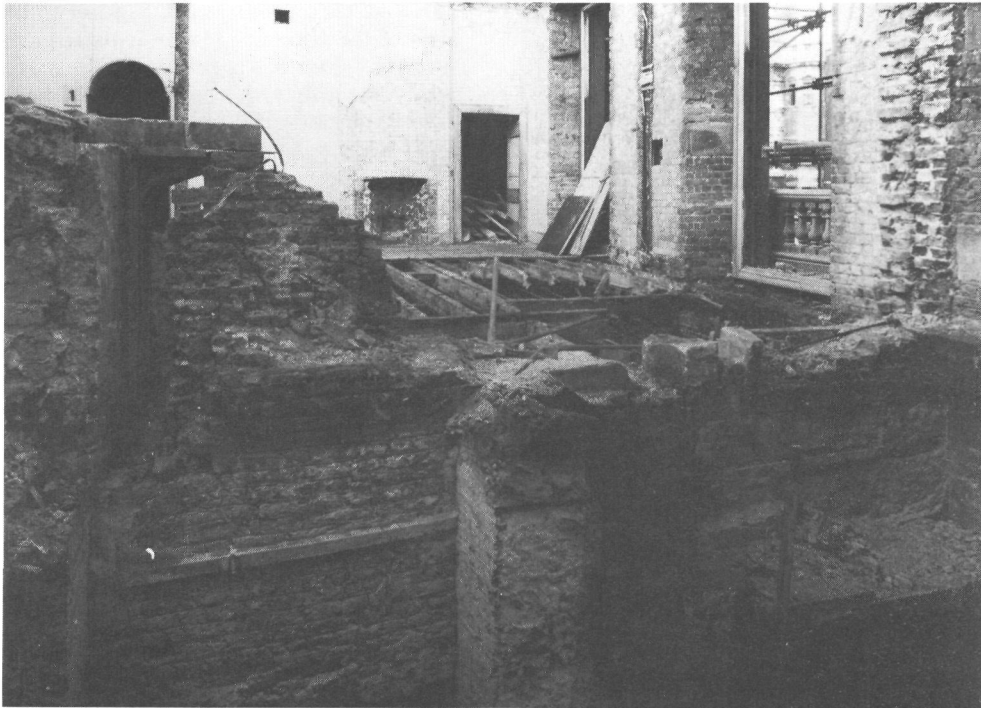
Whitehall: Great Close Tennis Play, south wall II.T.2 from the gallery at first floor level, showing remains of viewing windows (Crown Copyright)
